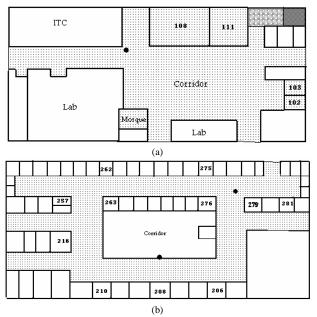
Building Layout with three access points and an excellent signal strength covering the whole building. (a) First floor, (b) Second floor.
